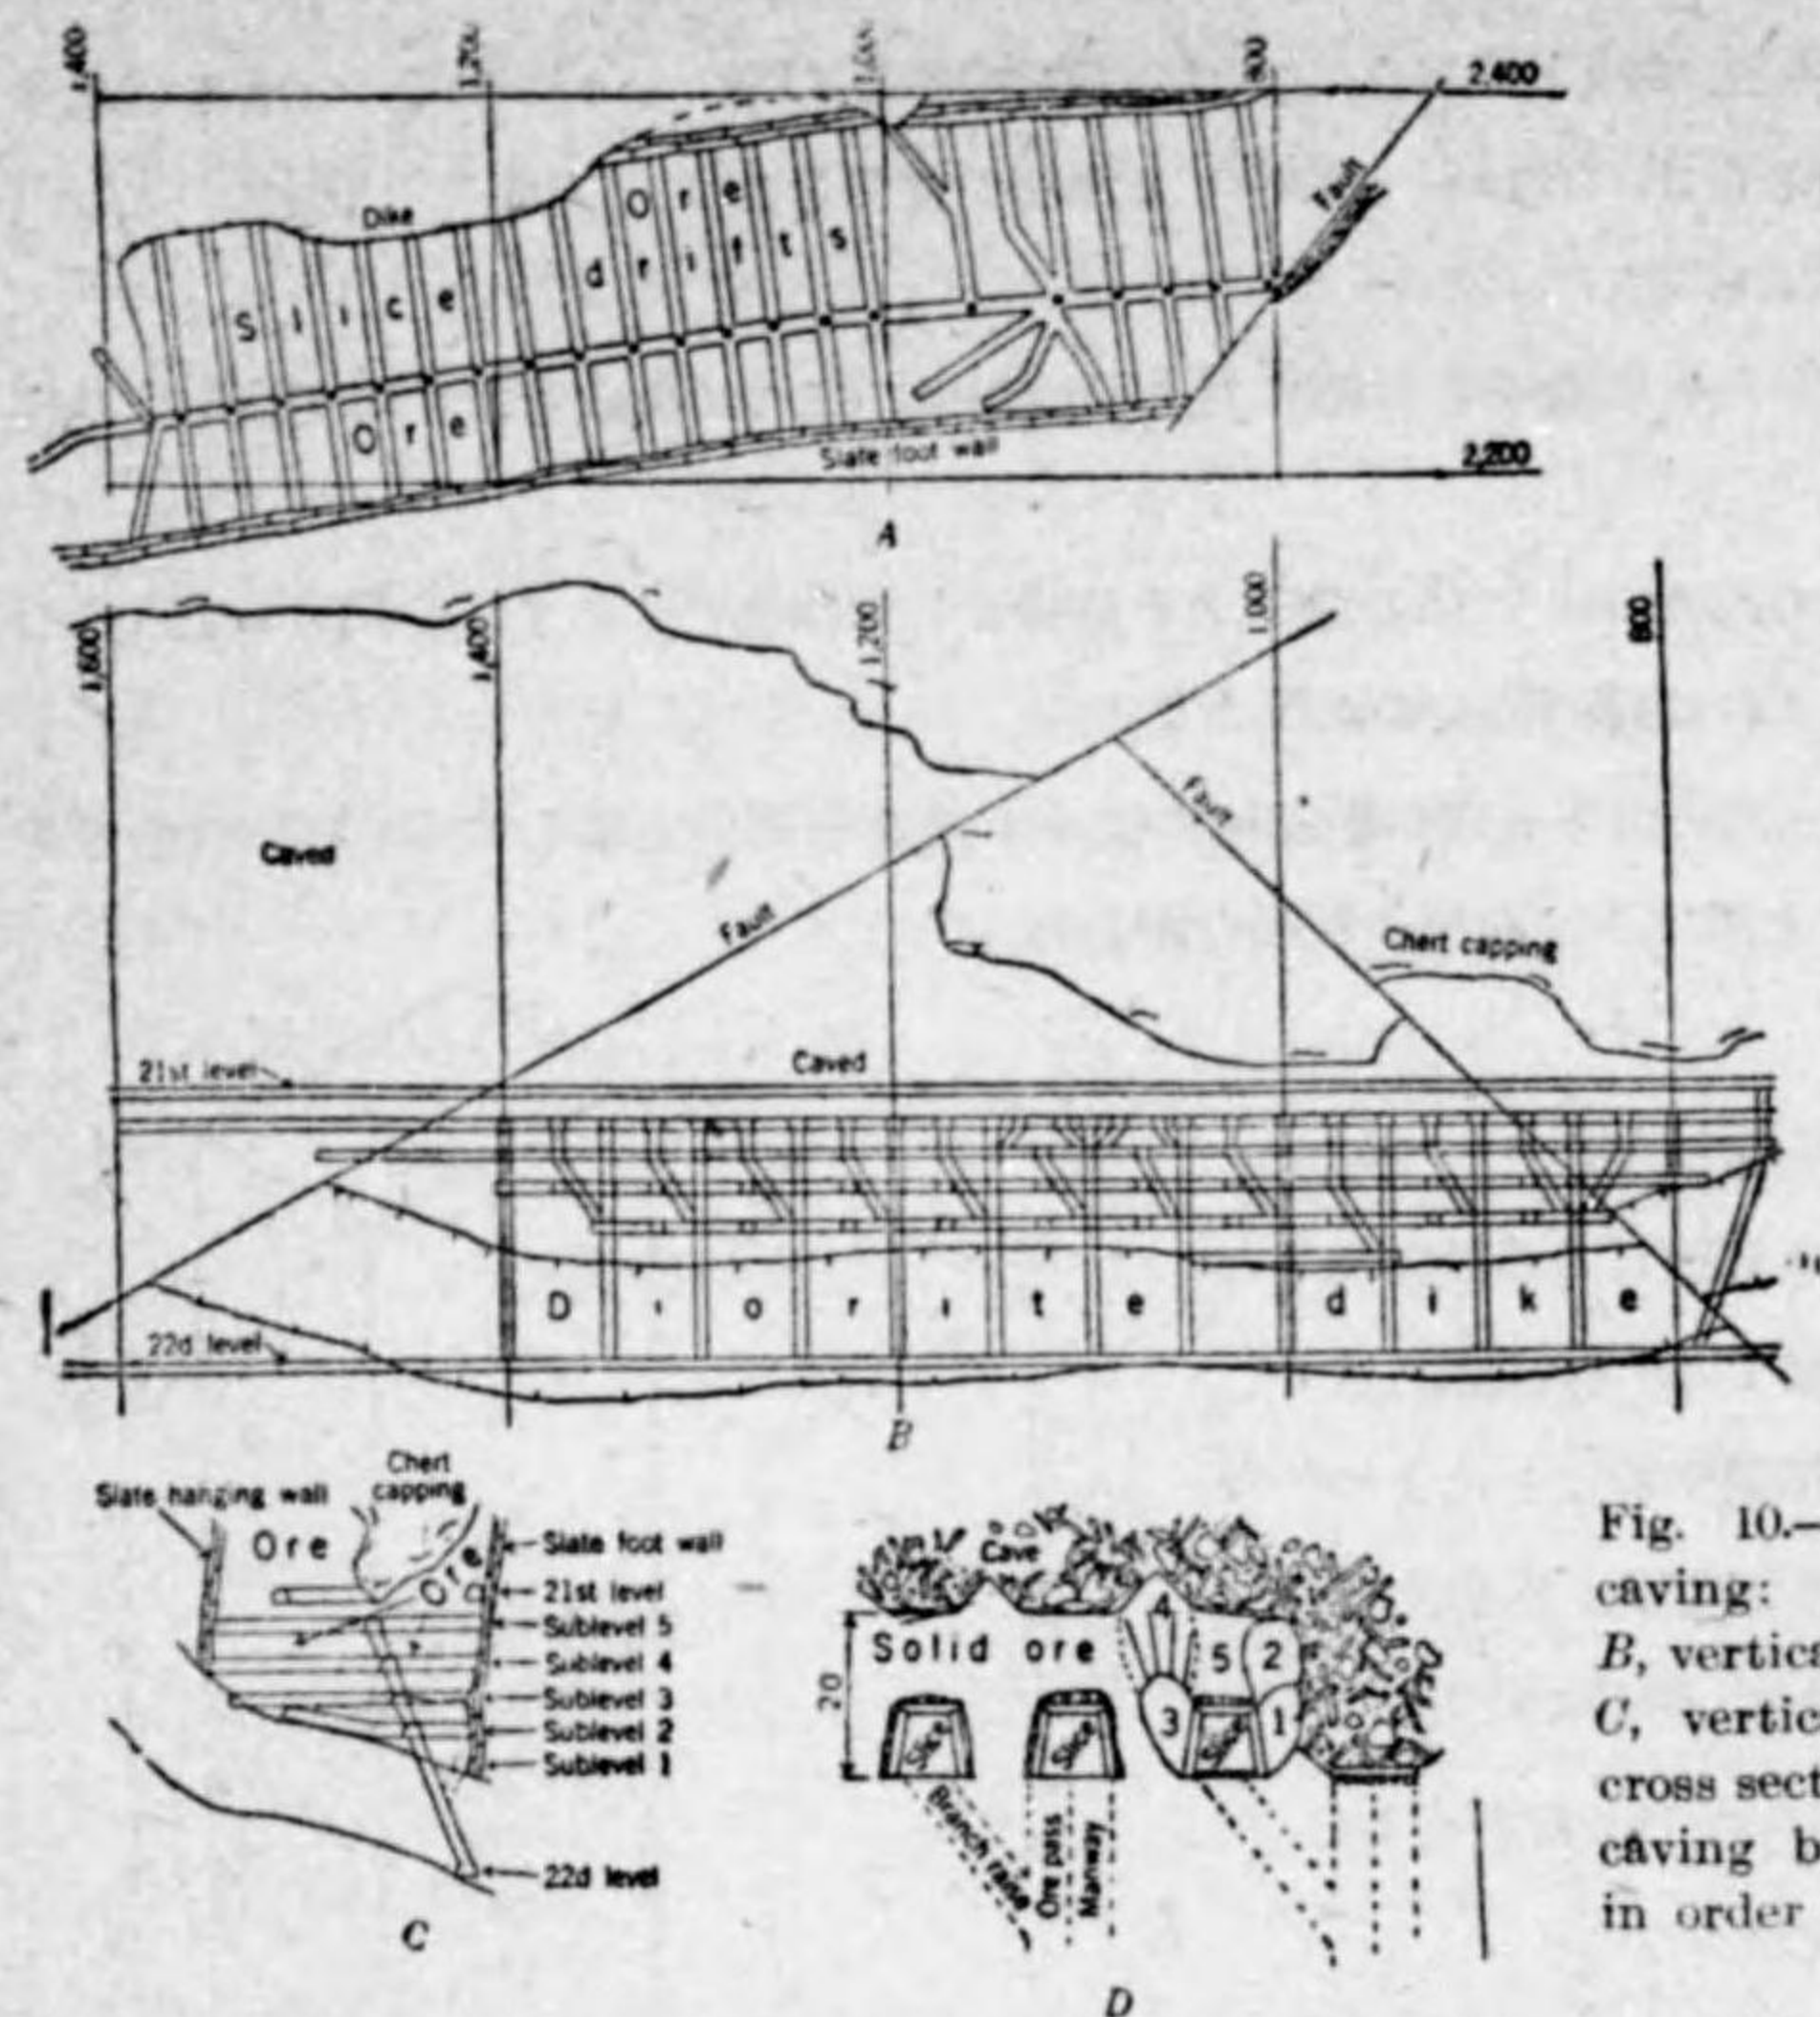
Example of sublevel caving: A, plan of sublevel: B, vertical longitudinal section: C, vertical cross section: D, cross section, showing details of caving back, cuts blasted out in order shown
